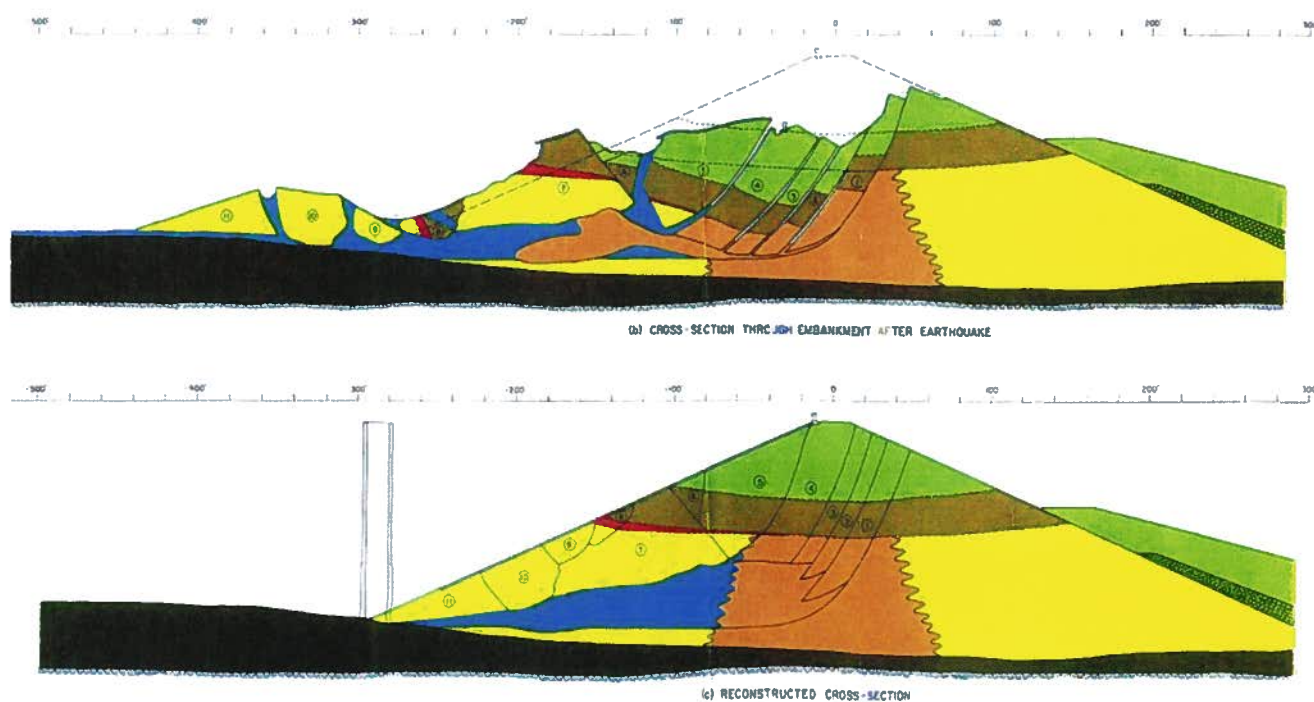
Cross section of the Lower San Fernando Dam (a) after failure; and (b) schematic reconstruction of the pre-failure section (Seed et al., 1989).
